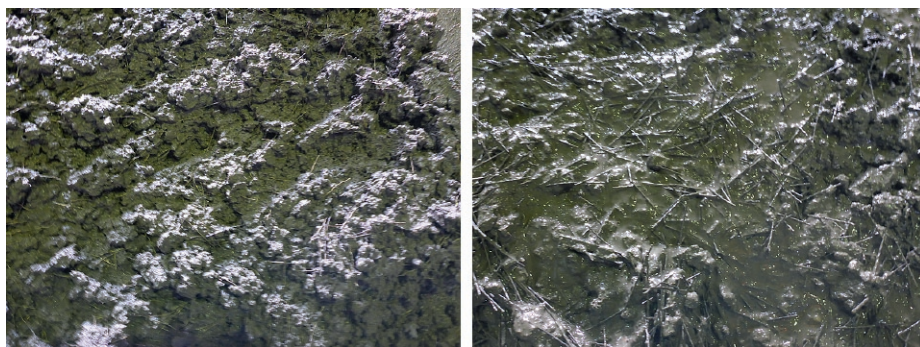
Sprayed on concrete shell – with steel fibres (left) – and polymer fibres (right). // Bild 13. Aufgespritzte Betonschale, links mit Stahl- und rechts mit Polymerfasern. Photo/Foto: SBK
